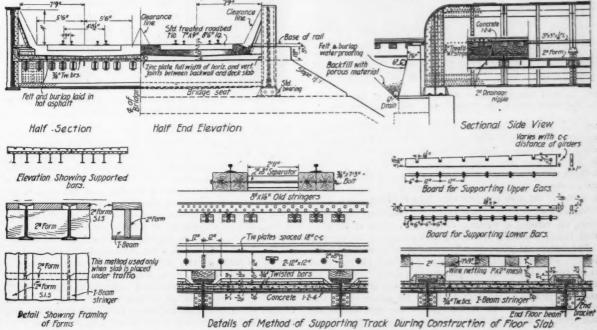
Type "H" Floor for Double Track Through Plate Girder Spans.
